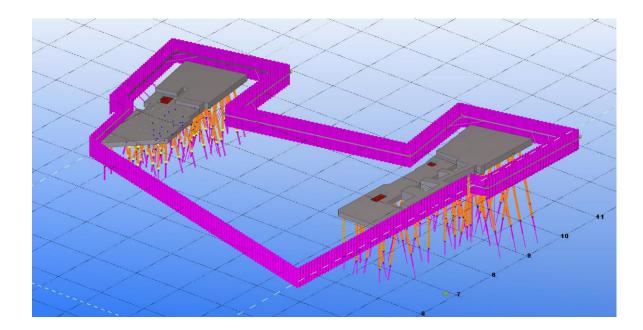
Tekla model of the foundation with sheet pile retaining wall and anchoring.
